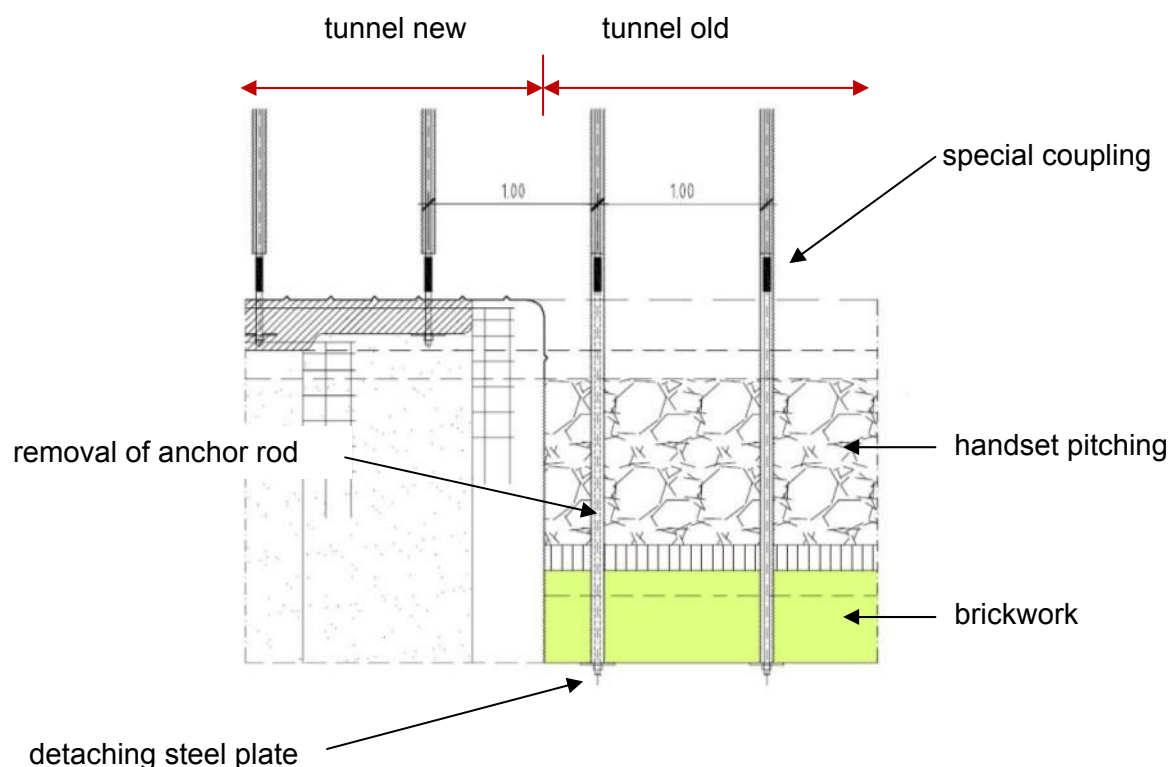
, tunnel enlargement – Phase 1, tunnel cross section (source Beton- und Monierbau)
